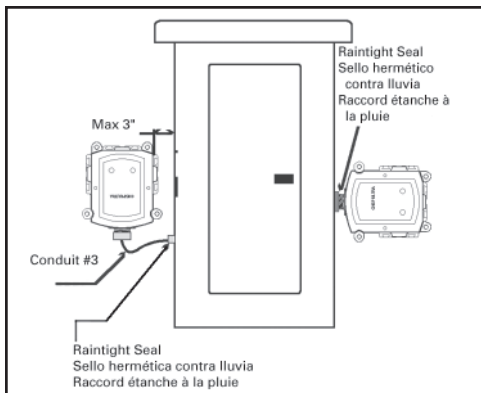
Outdoor Installation (1)/Instalación exterior (1)/Installation à l'extérieur (1)
